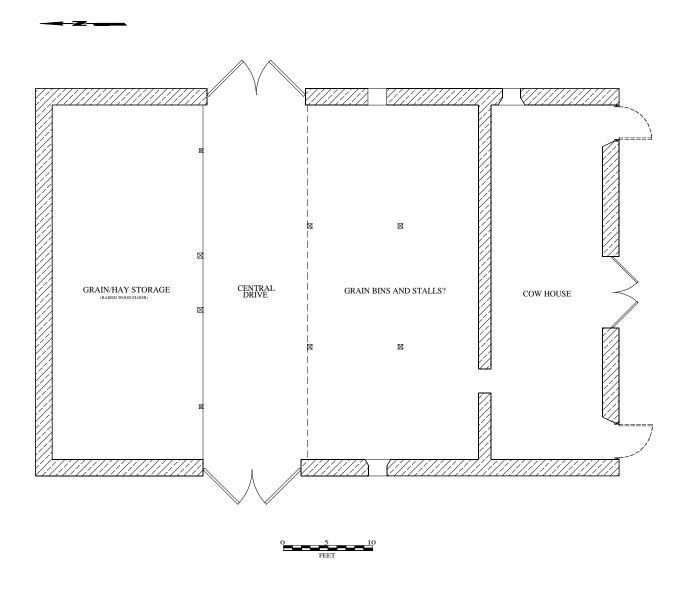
First floor plan of the Howarth Barn, showing the layout of the structure prior to its conversion to living quarters (FRR 2001).
